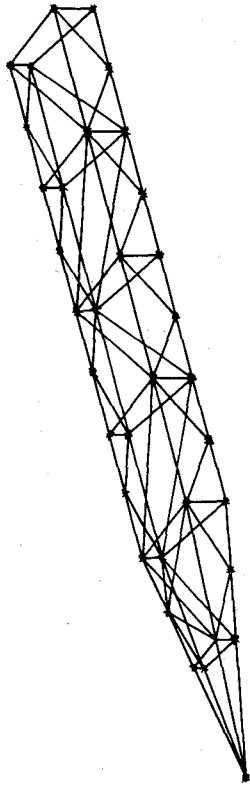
Isometric view of bottom part of 64-m quadripod leg
